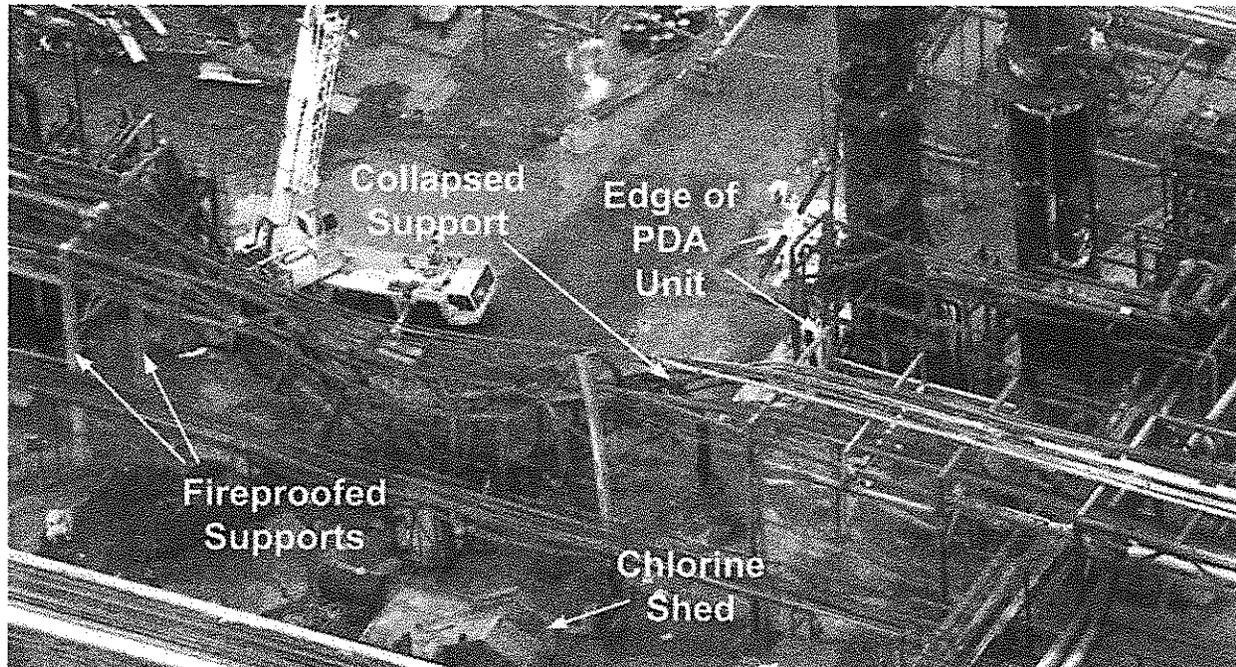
Extractor towers (upper right) and collapsed pipe rack
